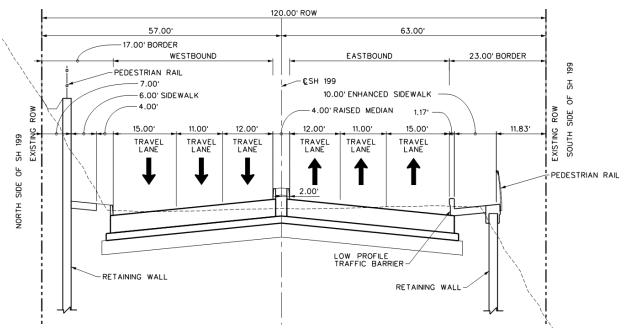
Section 2 – Ohio Garden Road to Extension of 16th Street Typical Section Source: Freese and Nichols, 2017
